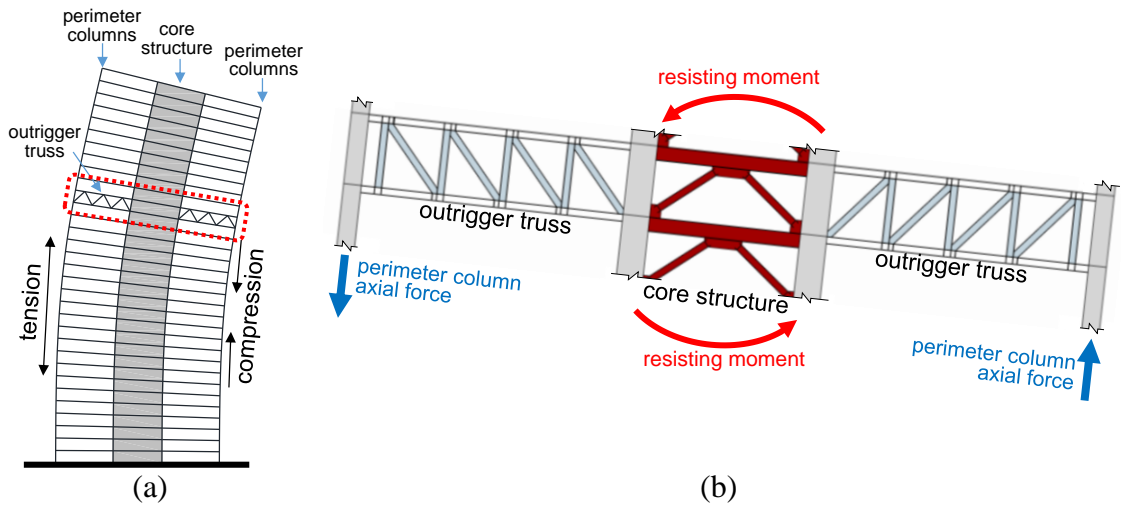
The (a) deformed shape of a structure with outrigger and (b) the enlargement of the outrigger layer
